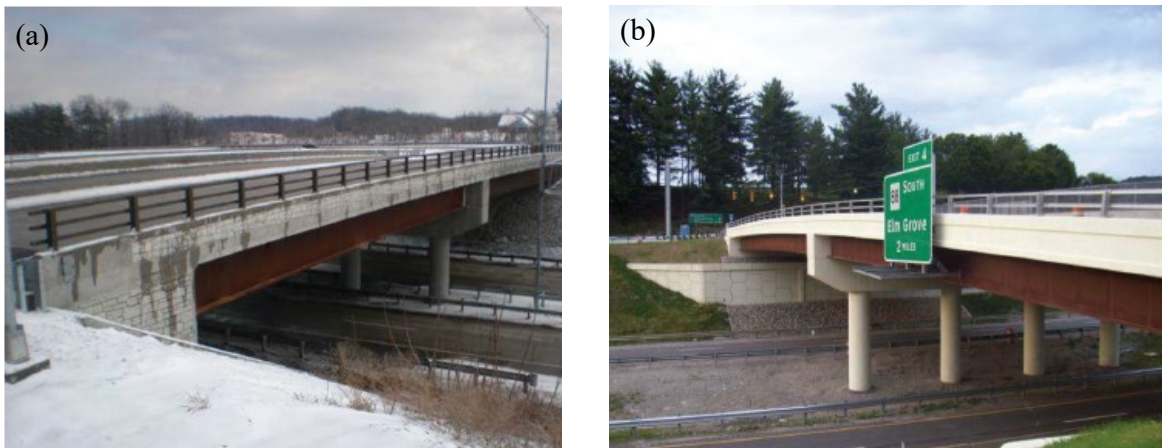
(a) Three Springs Drive Bridge, and (b) Washington Avenue Bridge [7].
